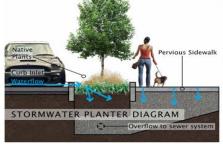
Site Evaluation and Concept Design for Christie Street, Brill Street, and Hawking Street
